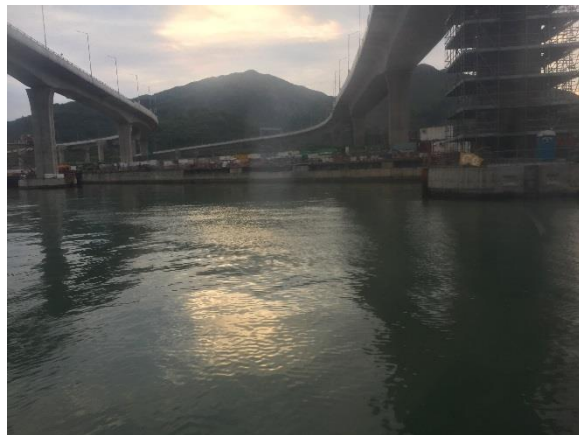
Mid-Flood at SR4(N) on 10 September 2018
